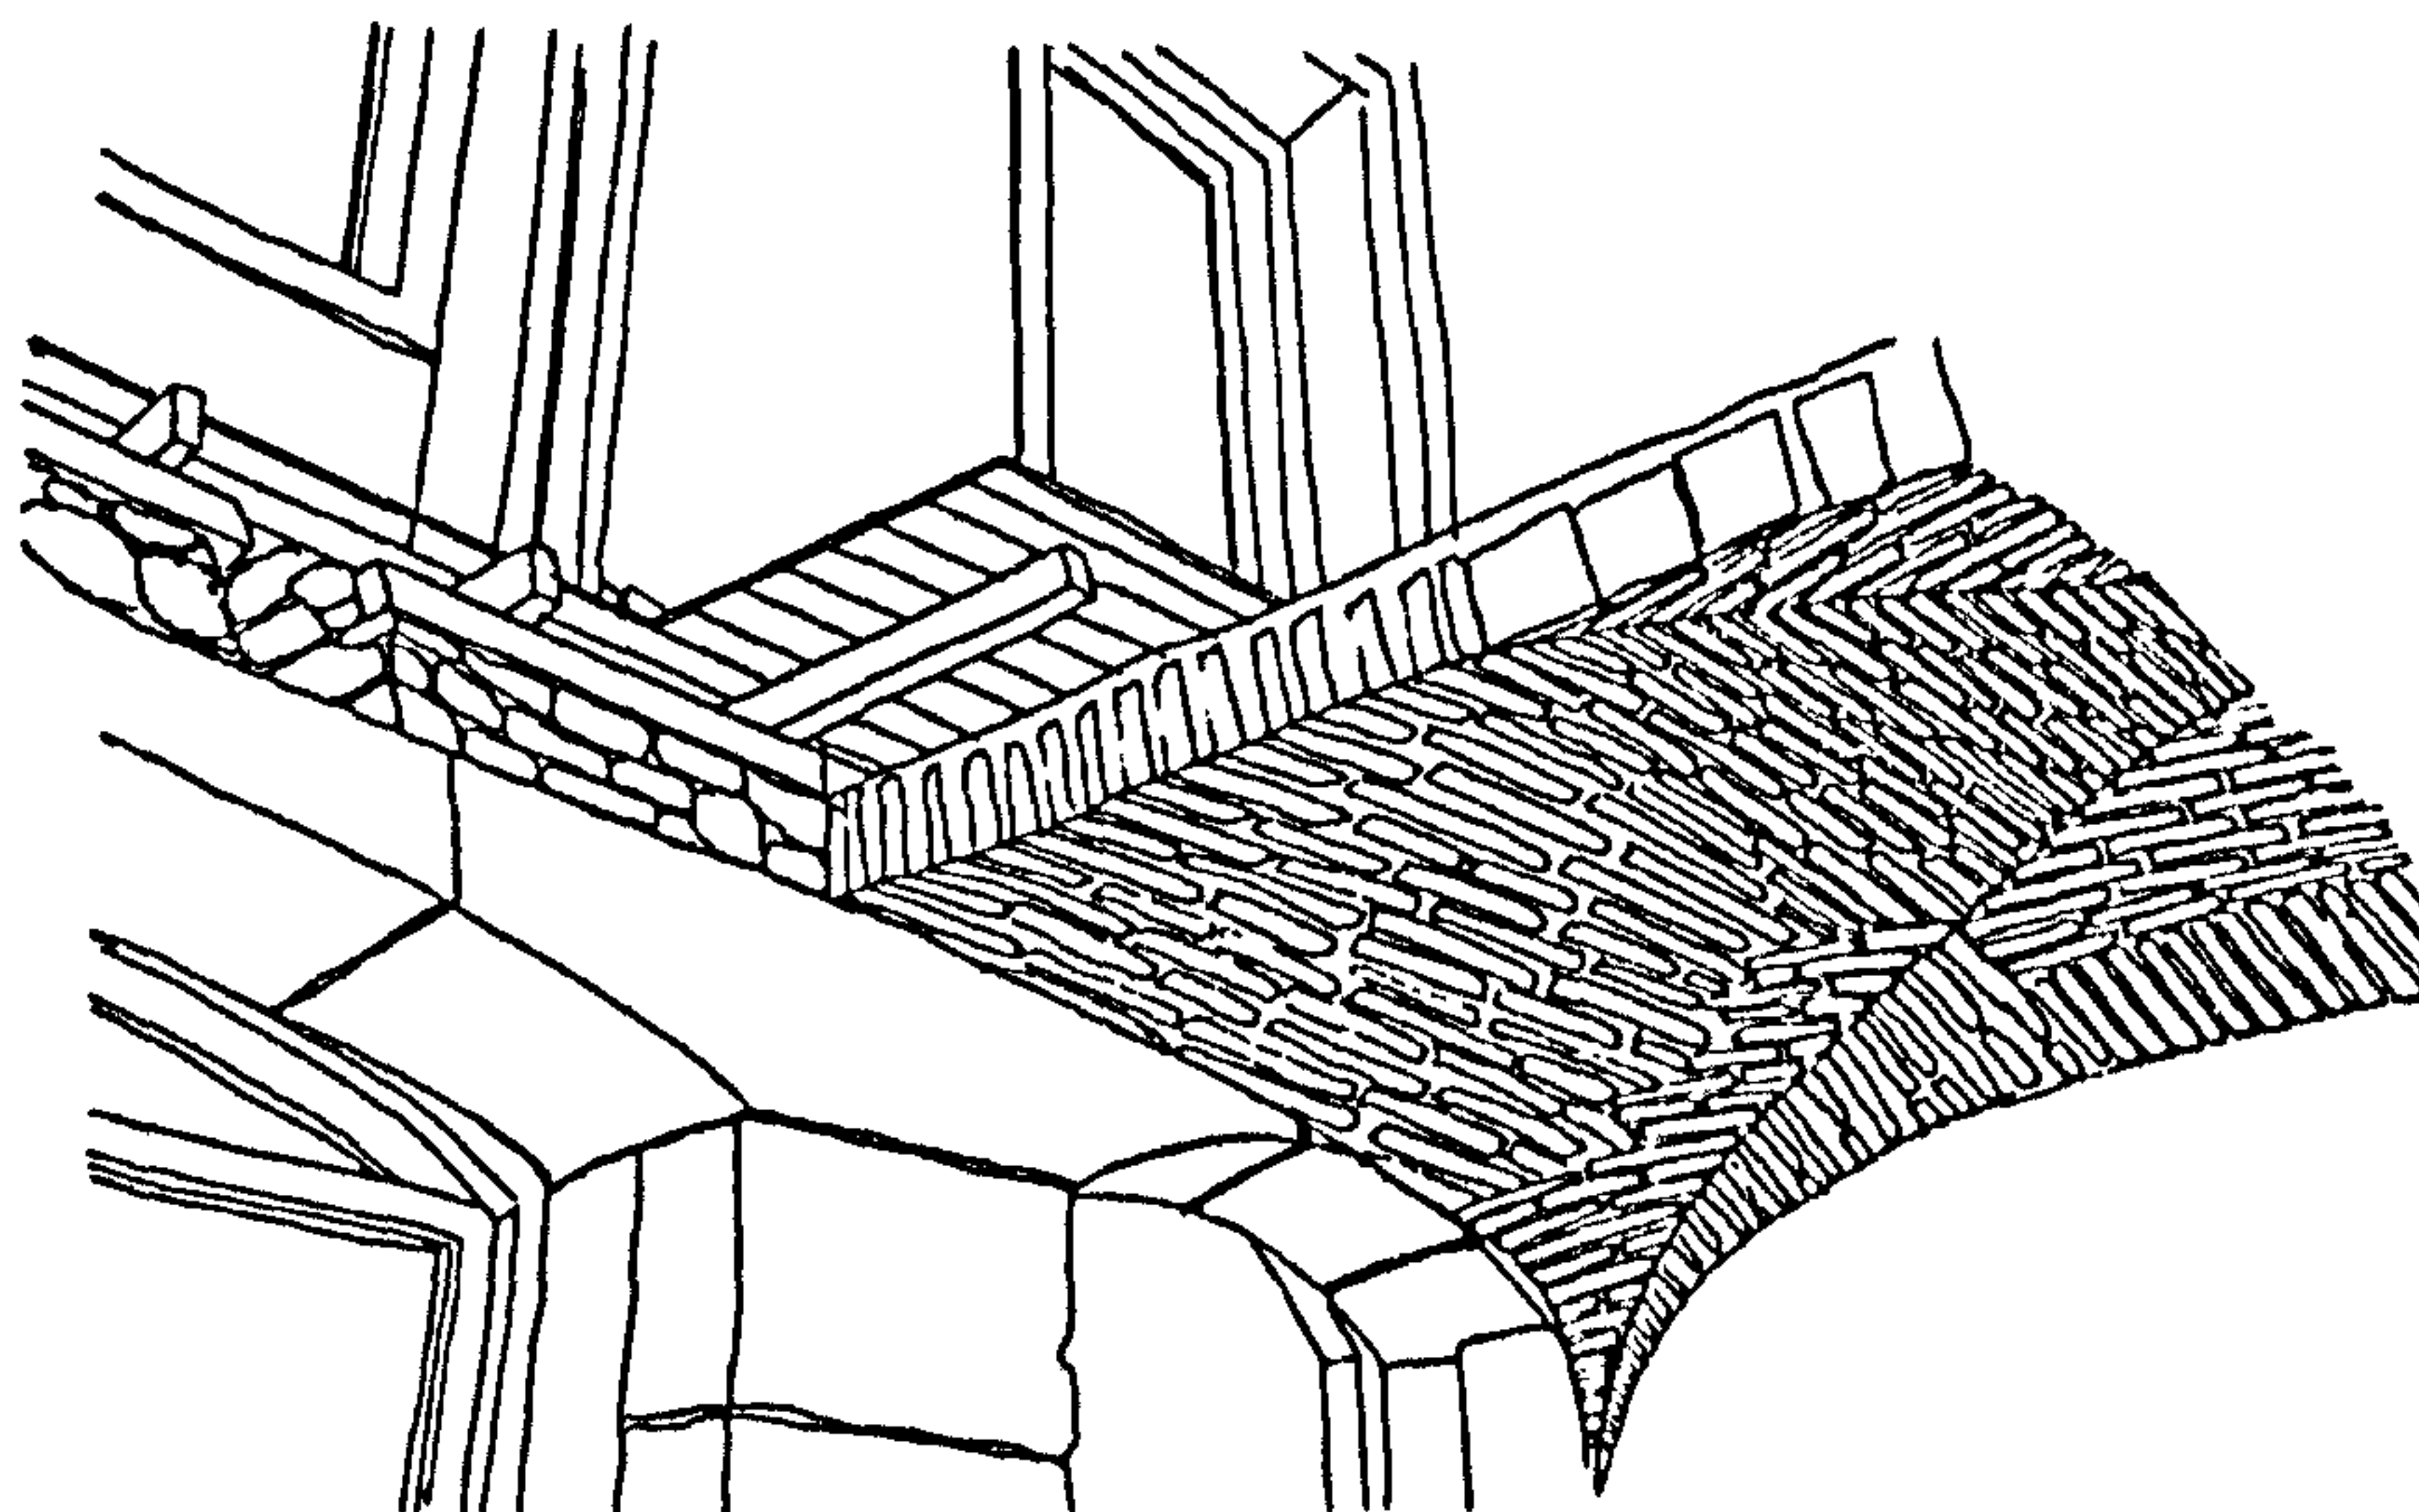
The lintel near a front door and wood structure of the upper floor over the vault
